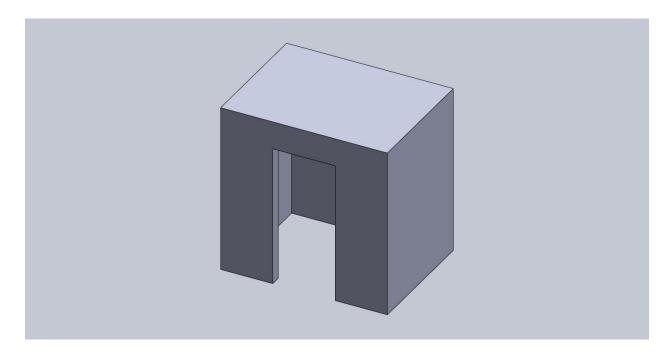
Concrete structure storm shelter designed in SolidWorks.
